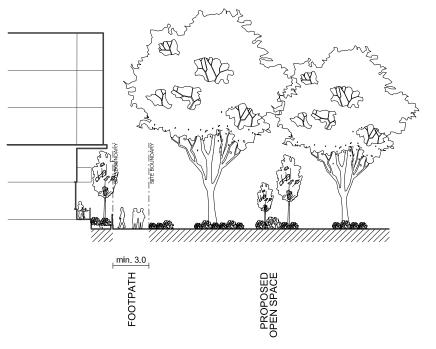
Section H1 -Rosebery Avenue General (Long Term)
